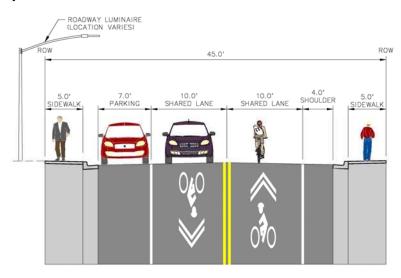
W. 30th Ave. (Spenard Road to Arctic Blvd.) - Alt. C
